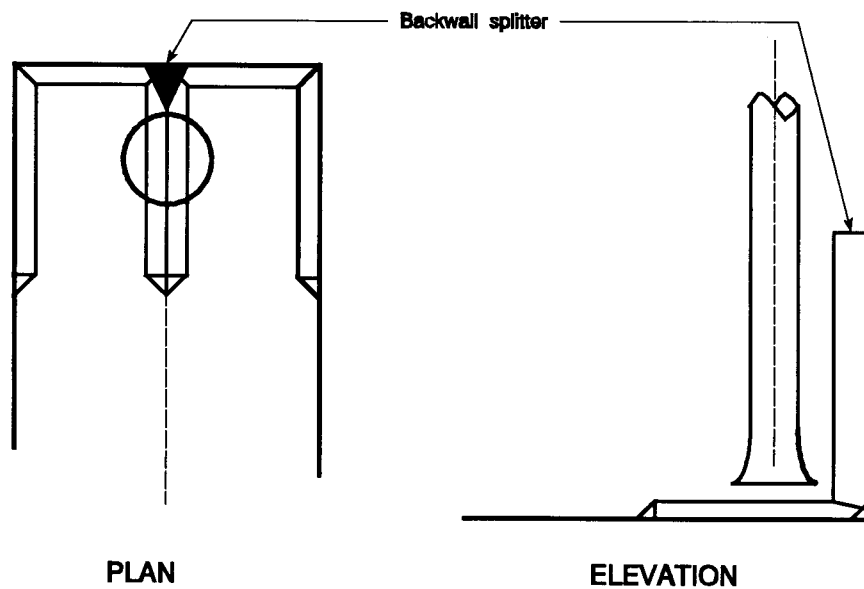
Modification E, back-wall splitter installed—recommended design.
